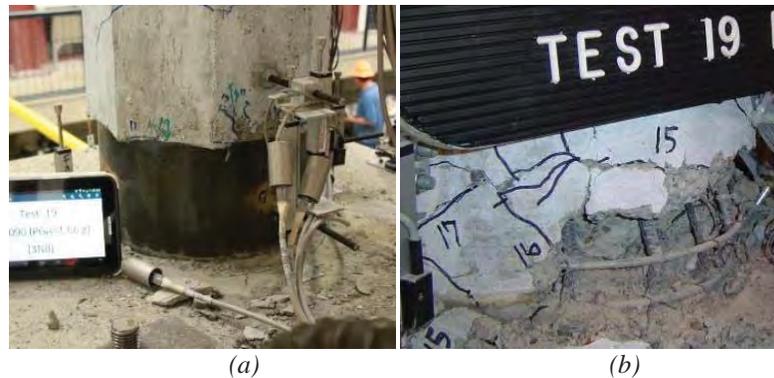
Damage to the column concrete after the 220% design level motion. (a) pre-tensioned, rocking bridge, (b) reinforced concrete bridge.
